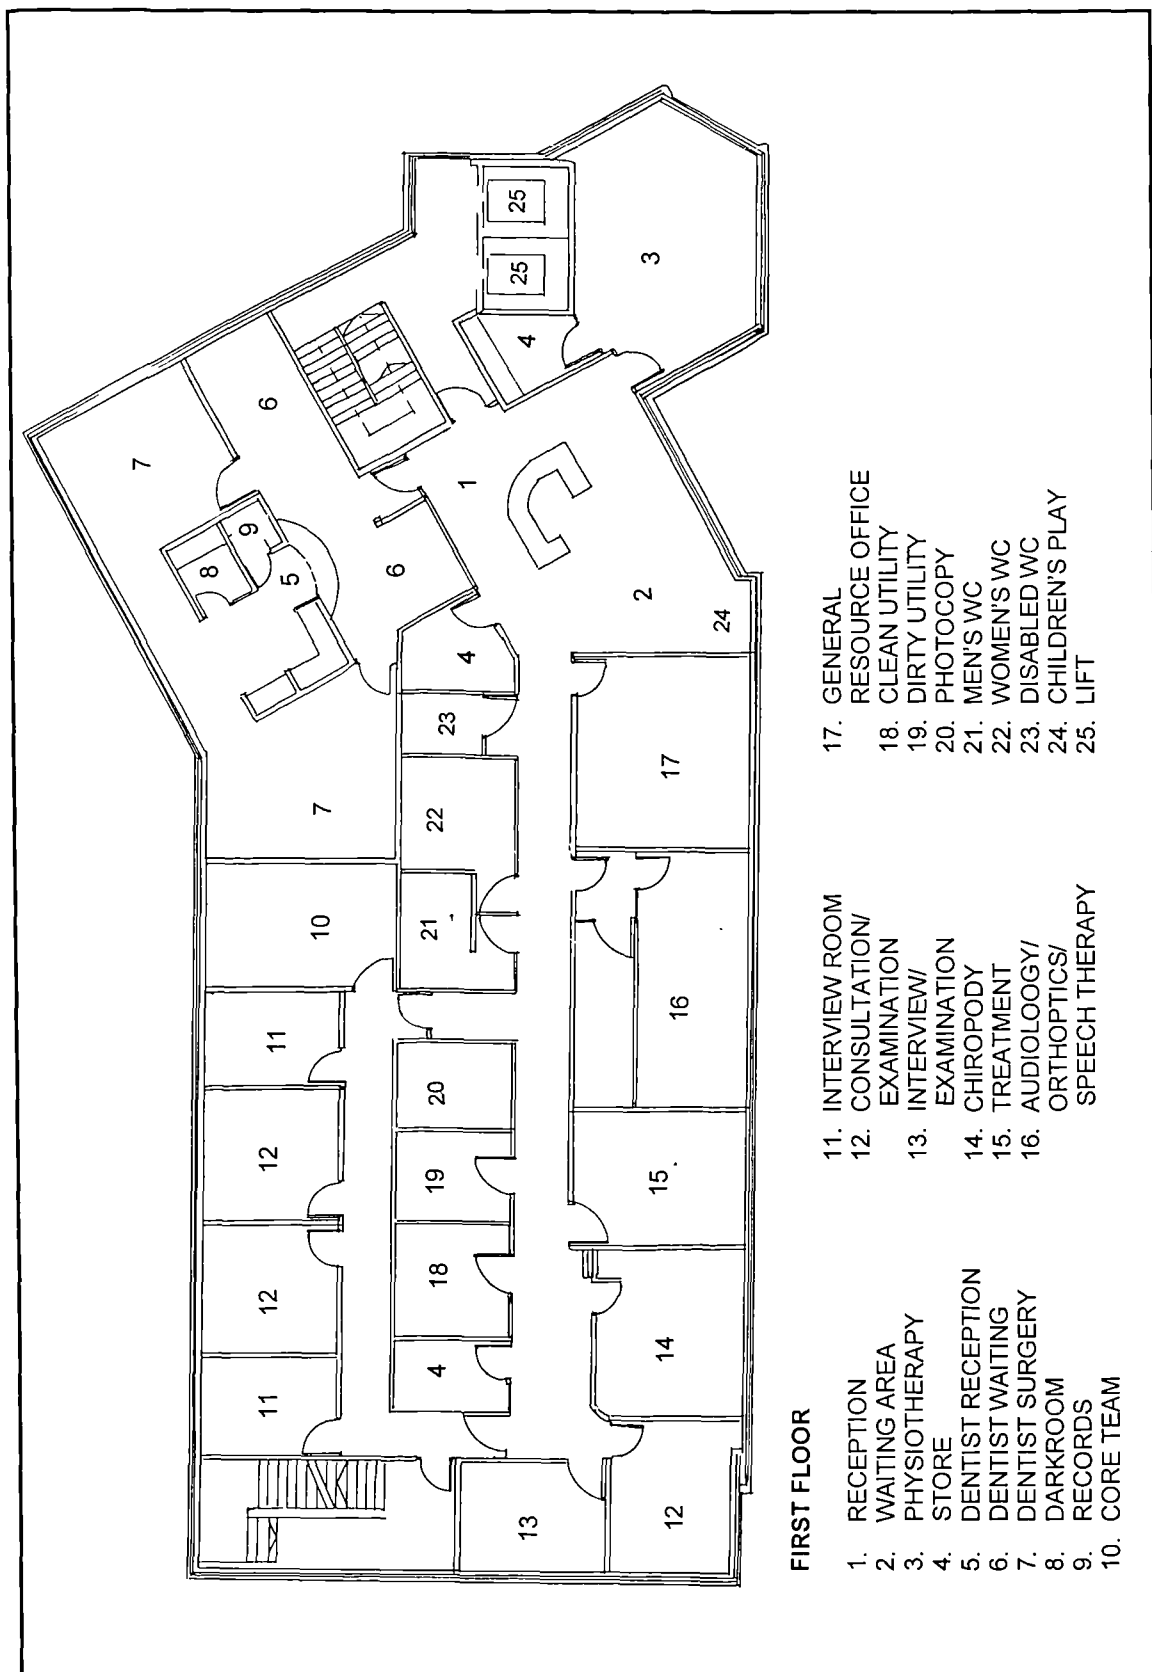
Kath Locke: First Floor Plan Architects: Snapes Design and Build
